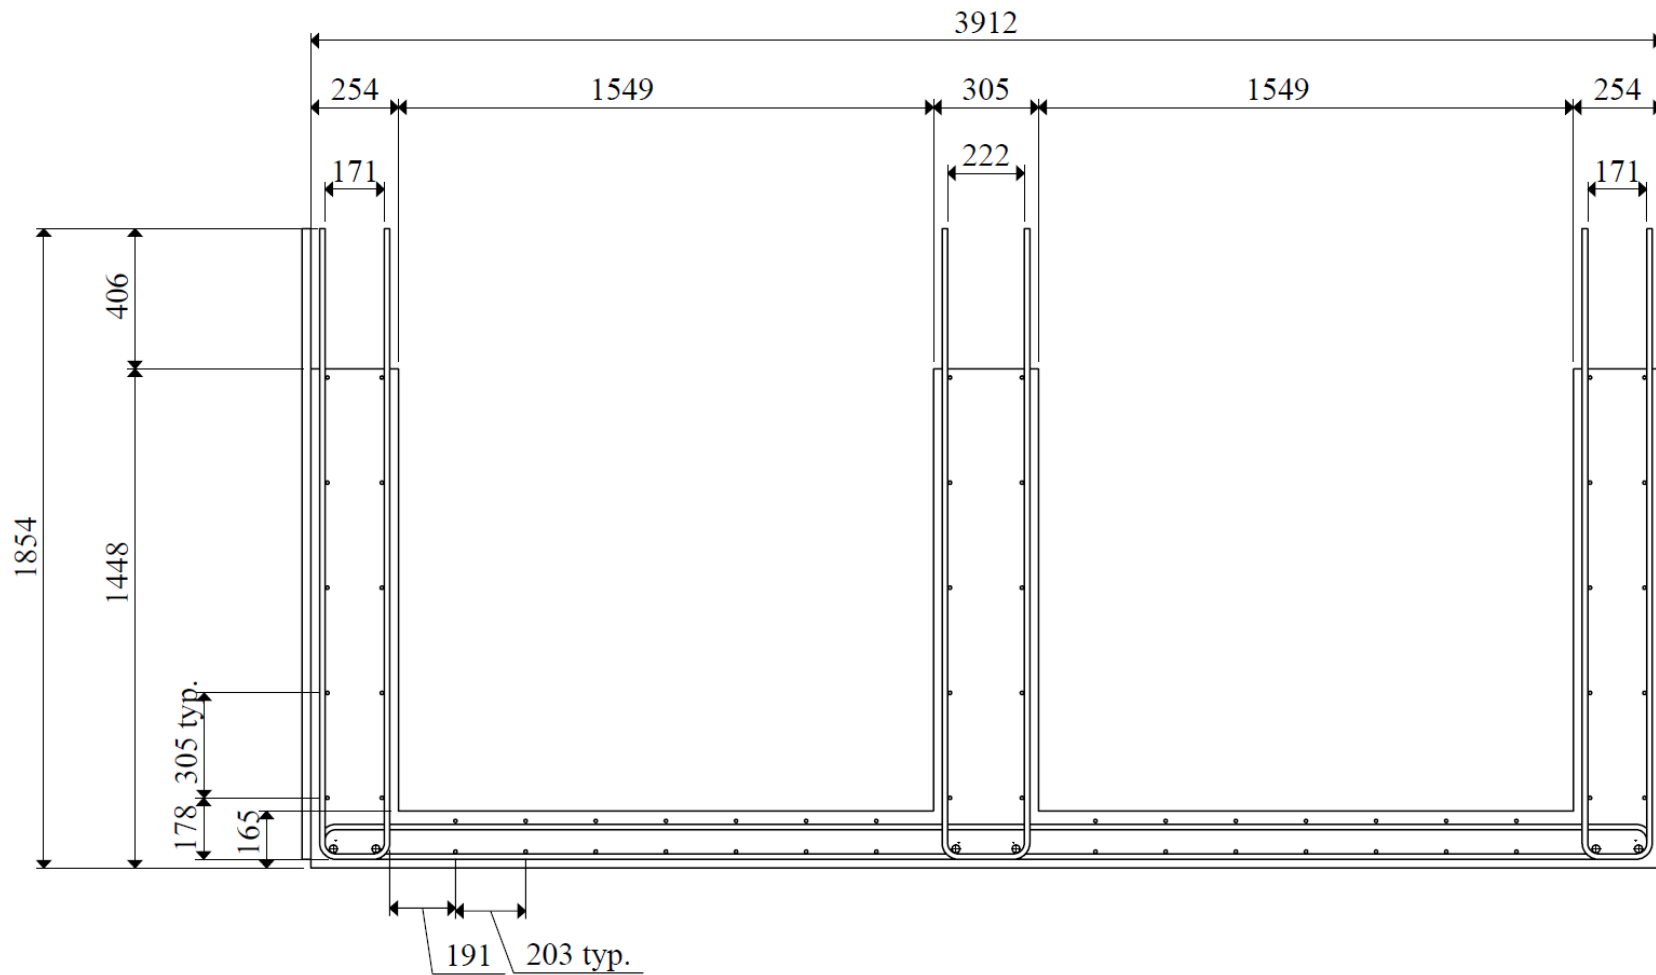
Steel reinforcement detailing in lower portion of box girder - front elevation view
